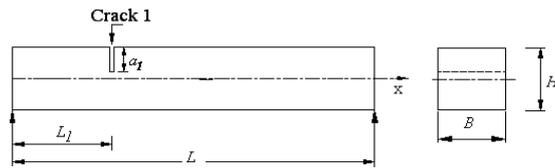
A schematic diagram of a cracked simply supported beam with single crack
